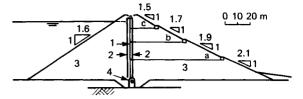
Major section of Megget dam, showing the positions of horizontal plate gauges a, b and c where (1) is the asphaltic concrete core, (2) the transition zones, (3) gravel fill, and (4) the control gallery
